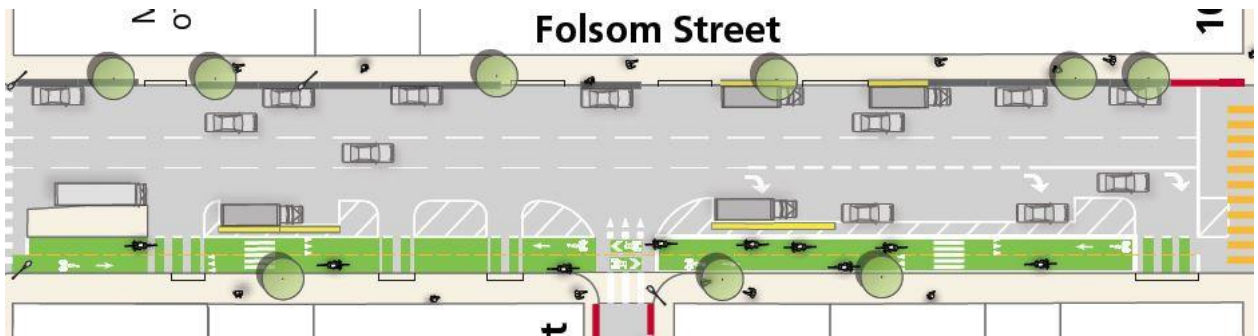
Typical Plan View of Folsom Street between 11th Street and 10th Street
